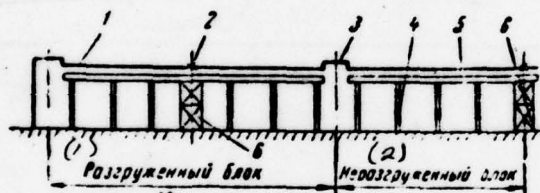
Recommended circuit of arrangement of compensators and fixed fastenings of pipelines. 1 - pipeline; 2 - fixed support; 3 - compensator; 4 - intermediate mast; 5 - span structure; 6 - stayed mast.
